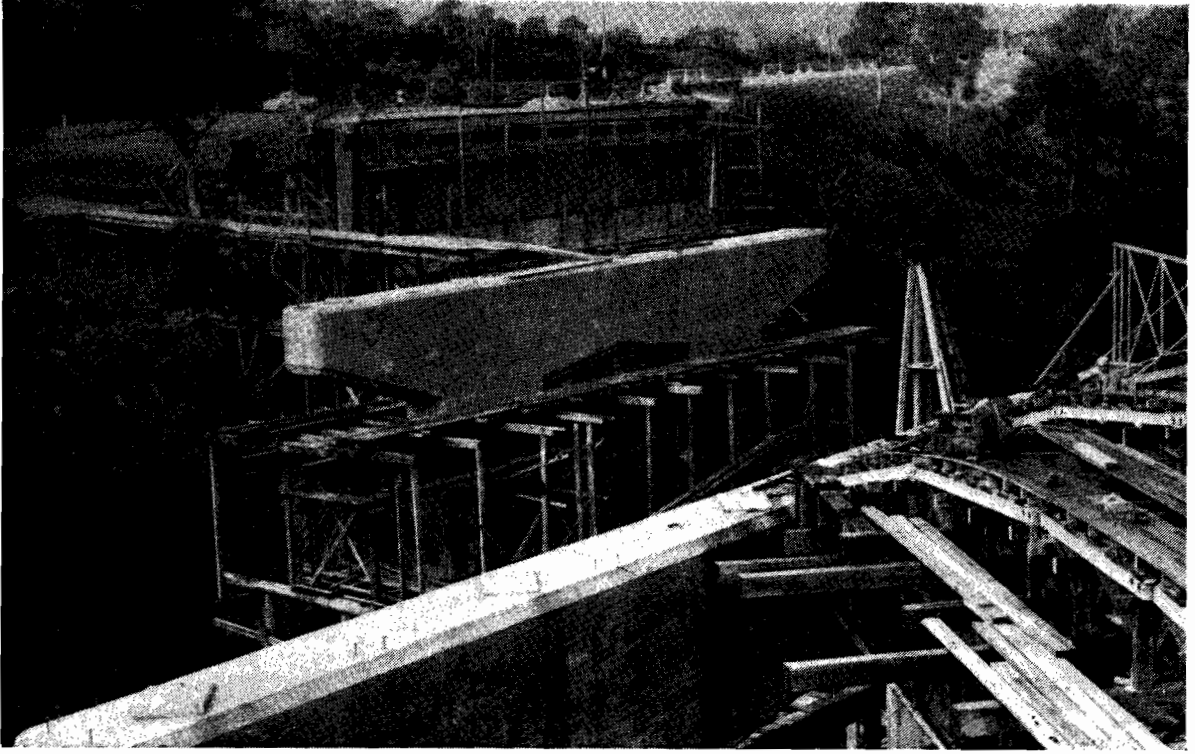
Bridge under construction, Johnston Street, over Yarra River.
